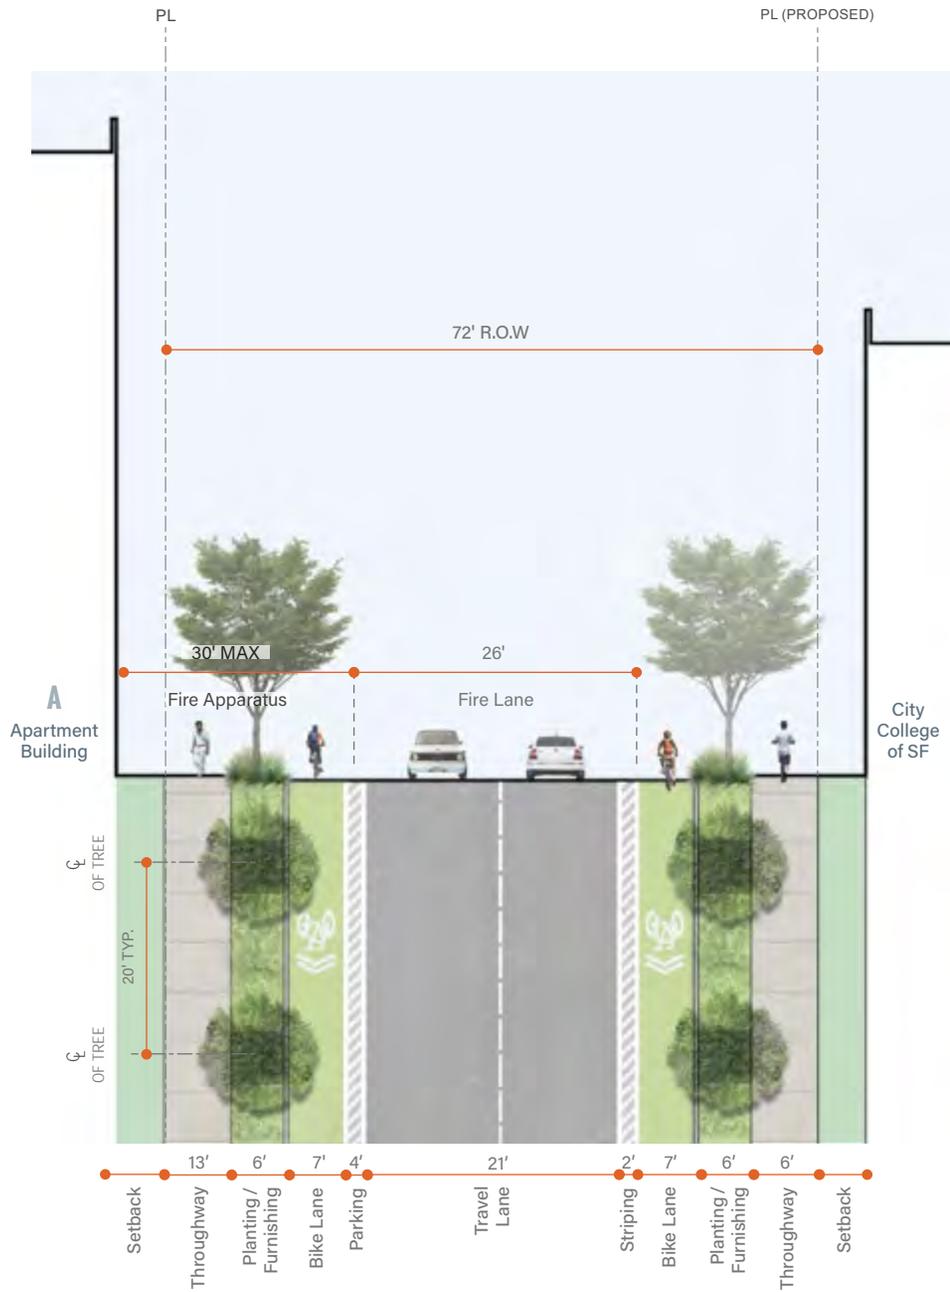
Lee Avenue, Section 3 *see "Figure 5.12-2: Lee Avenue, Plan Enlargements L.1-L.5", Site Plan L.4
